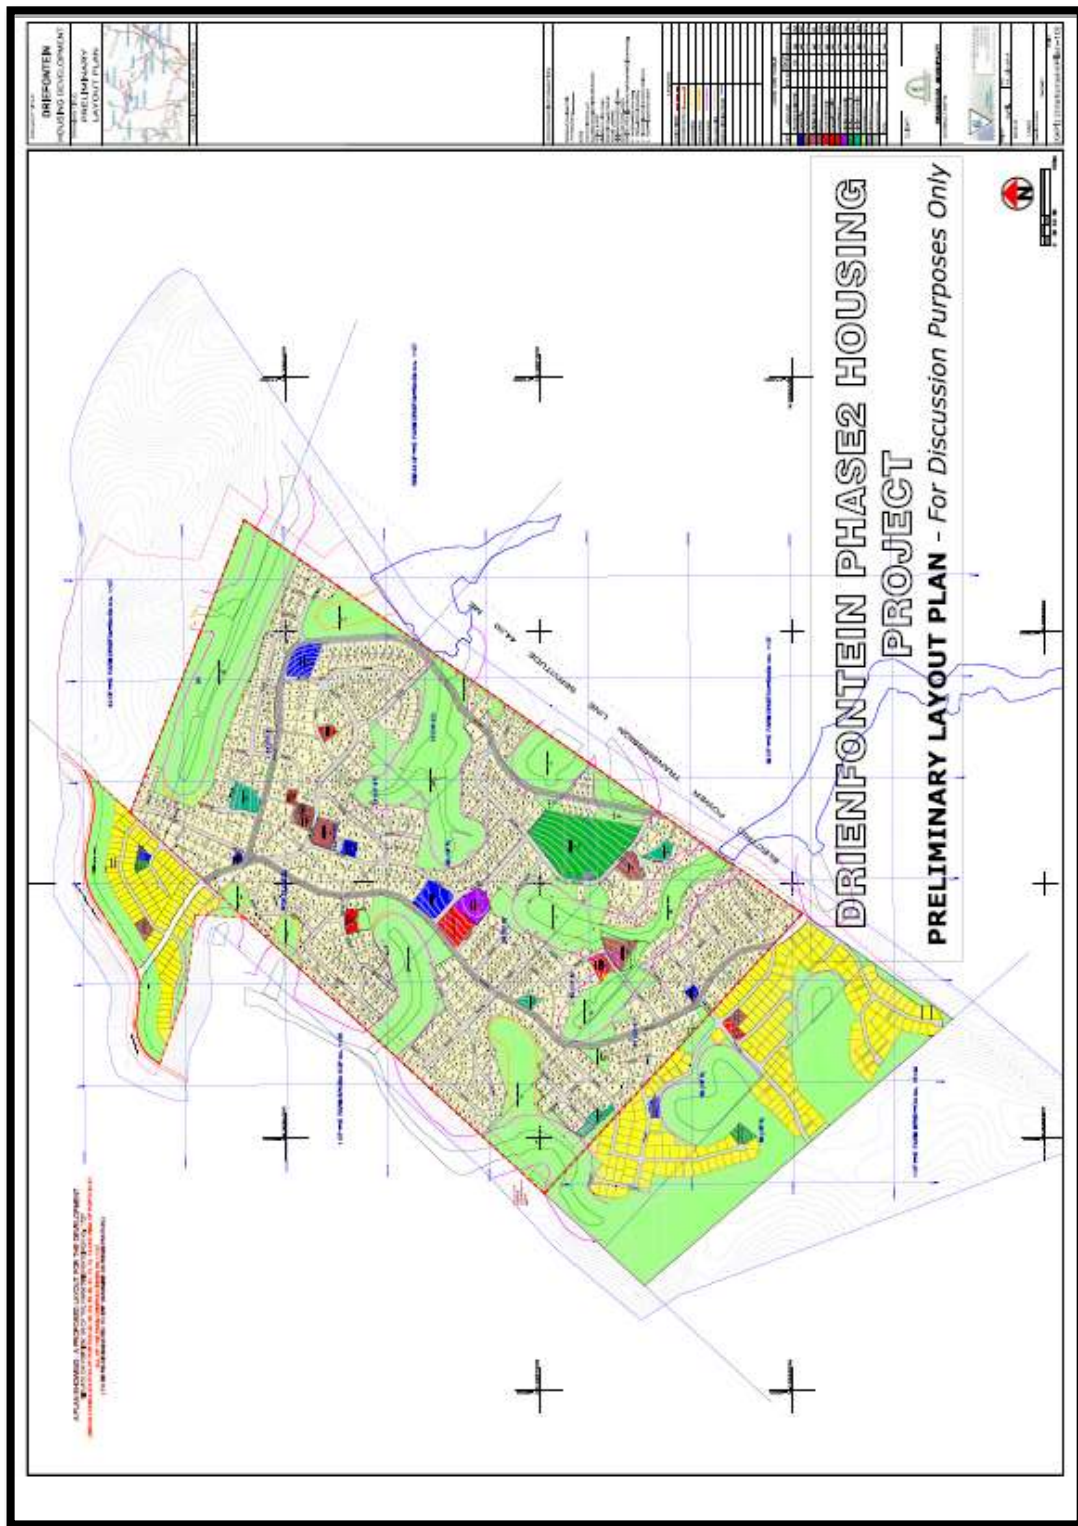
Preliminary layout plan of the proposed Driefontein Housing Project (Source: EnviroPro).
